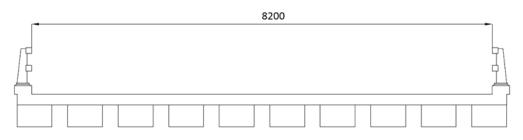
Typical Proposed Cross Section for Peak Creek Bridge
